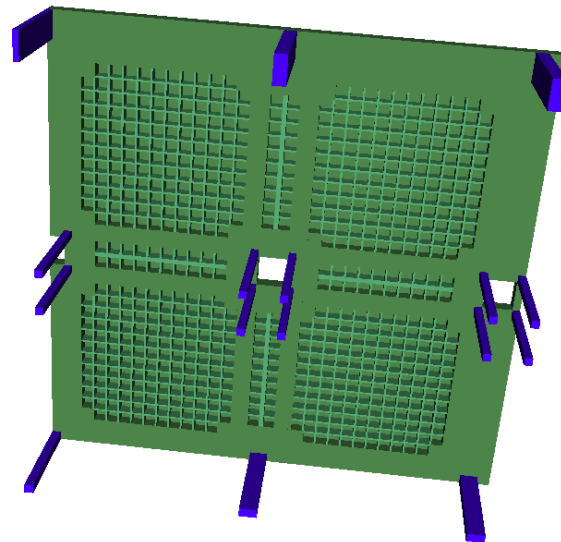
VIEW OF A WAFFLE SLAB CONSTRUCTION USING FLOOR PRO PROGRAM
